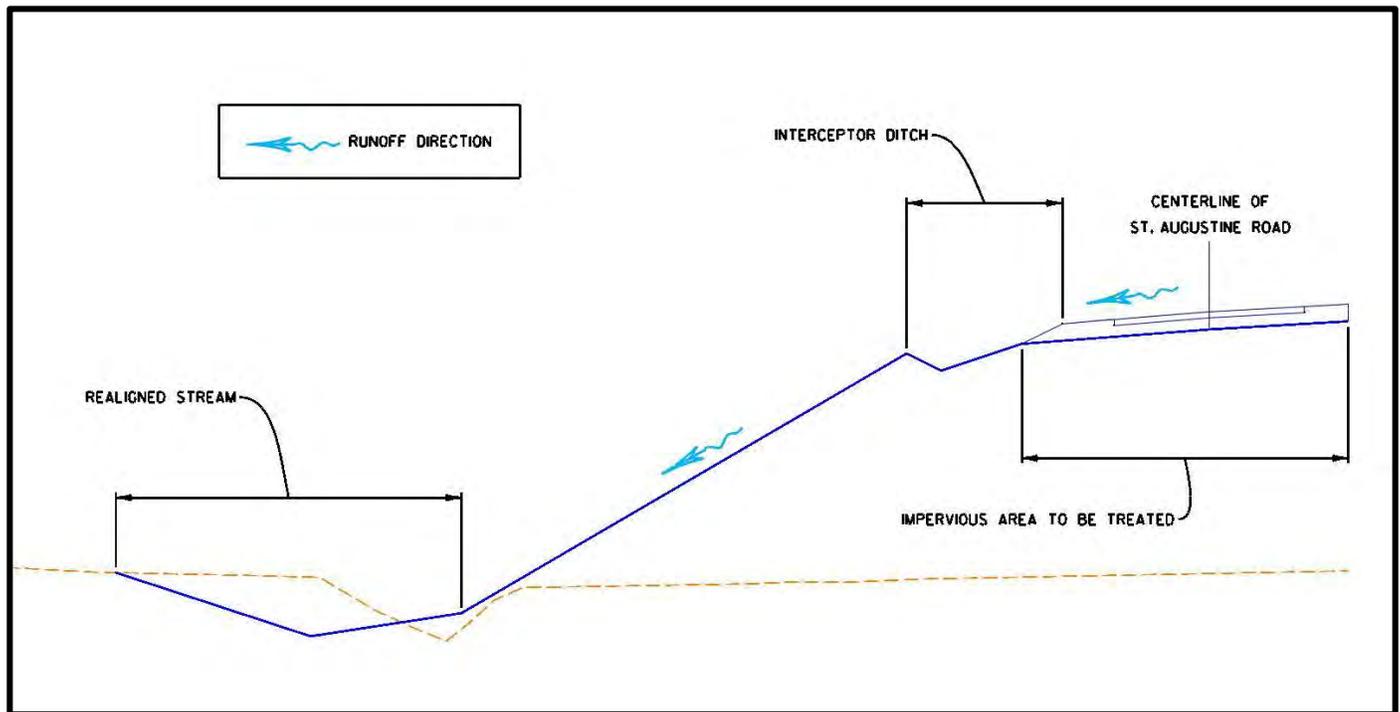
Typical Section of Proposed Interceptor Ditch along St. Augustine Road (view looking north along St. Augustine Road)
